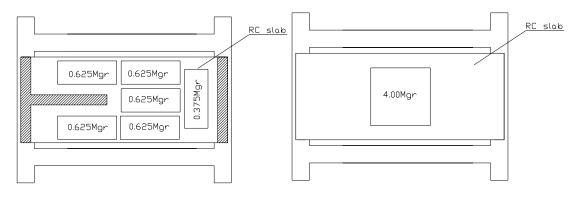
Arrangement of additional masses: Plan view: (a) 1st level, (b): 2nd Level (Specimen A1- A2, B1- B4).
